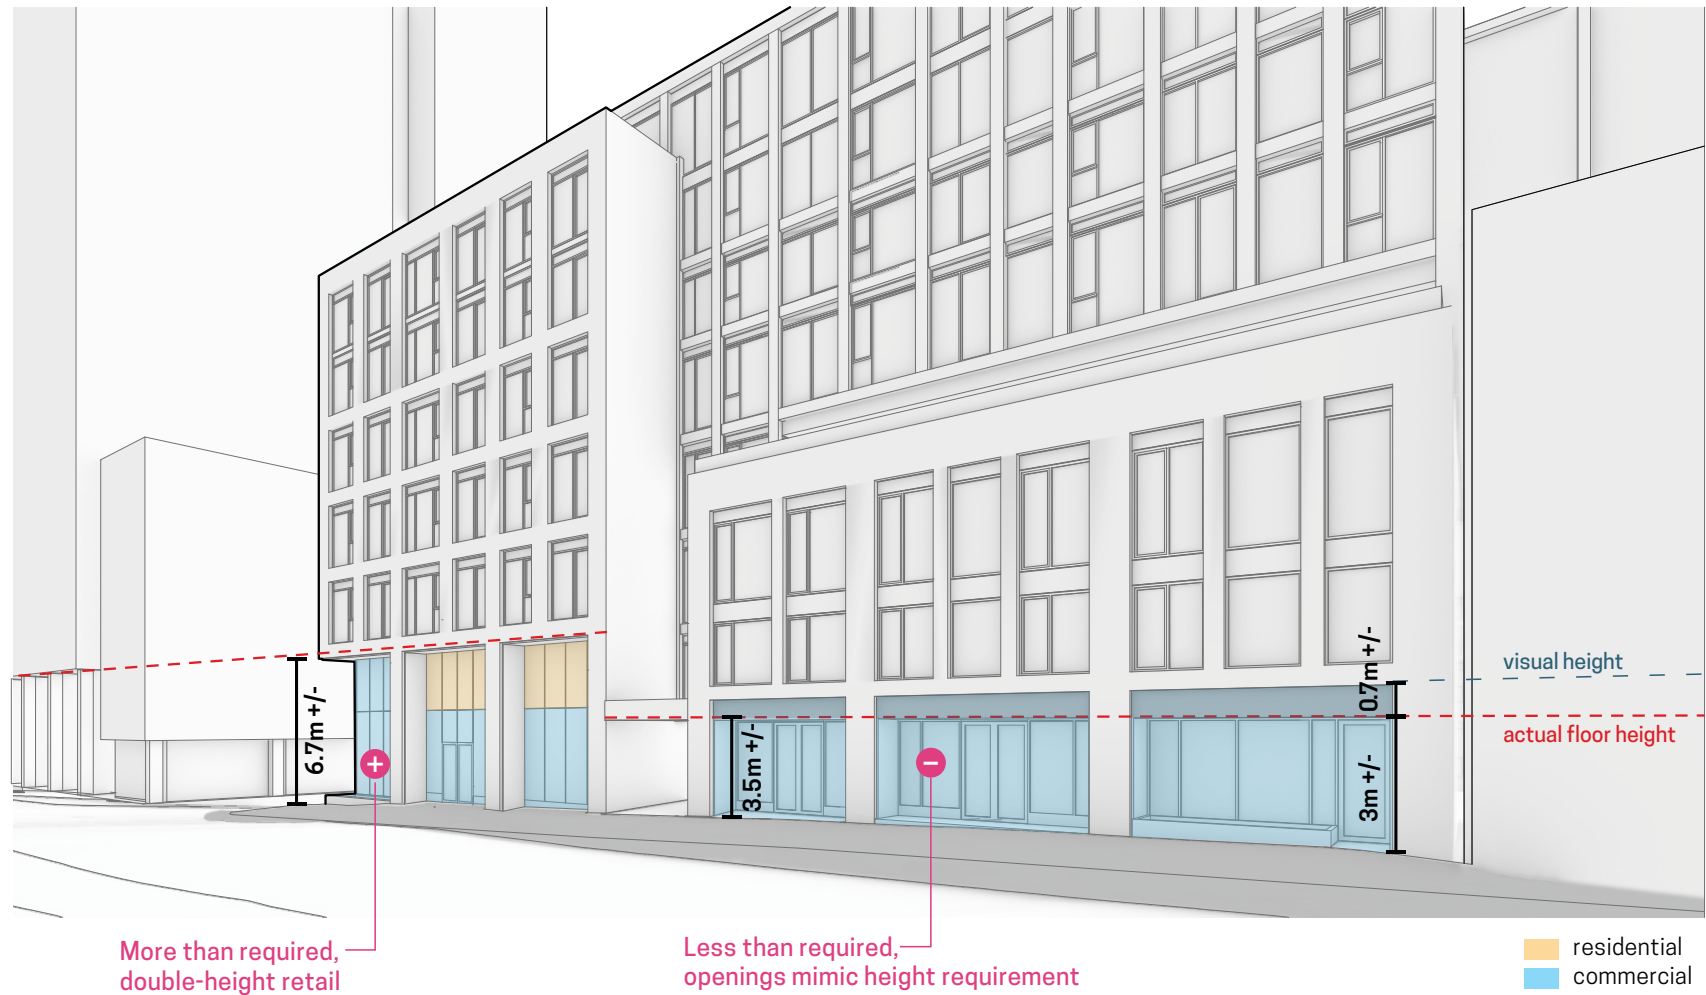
c Land-use at Grade: Resulting streetwall at corner of Barrington and George. Refer to Section 303 for slab heights.
